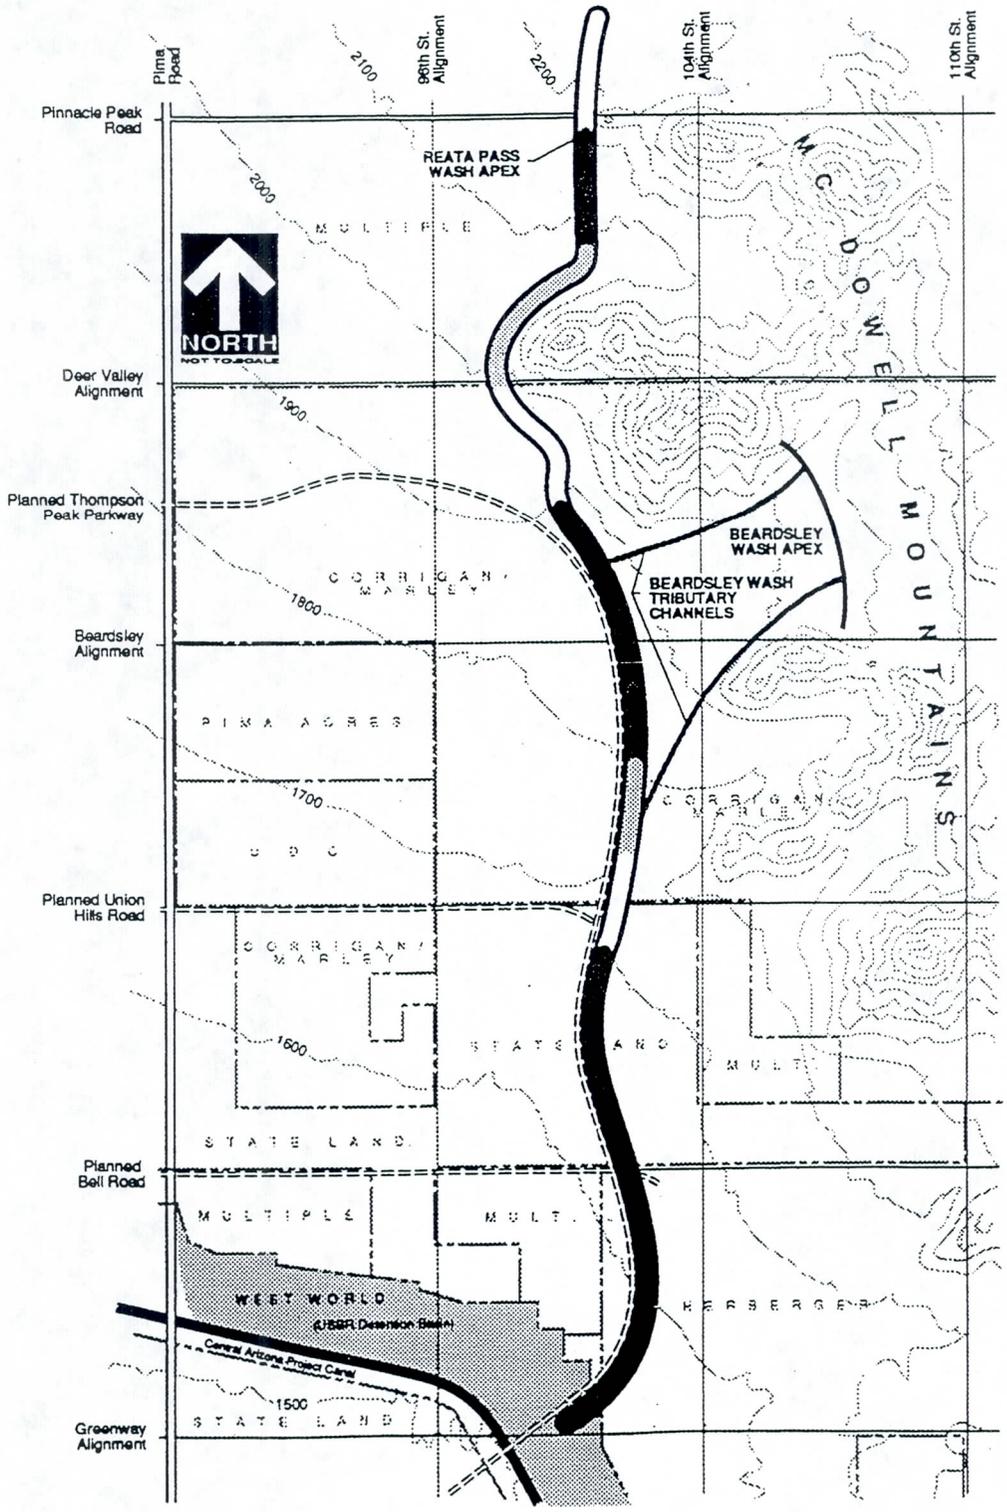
1989 Conceptual Drainage Design Plan.
